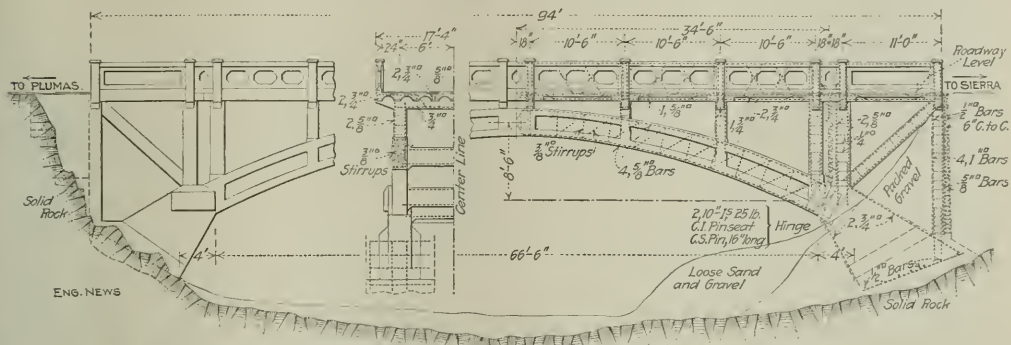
DESIGN DETAILS OF SLATE CREEK BRIDGE
